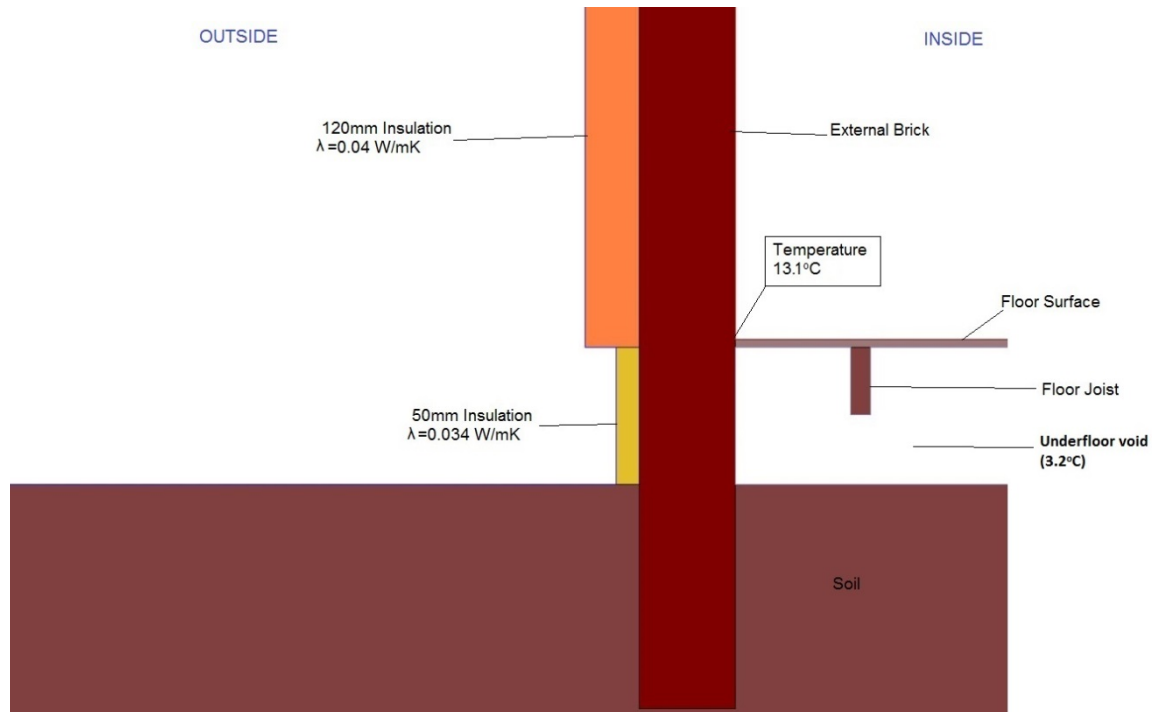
Junction between an uninsulated suspended ground floor and a wall with external insulation (typology R9) with below DPC insulation
